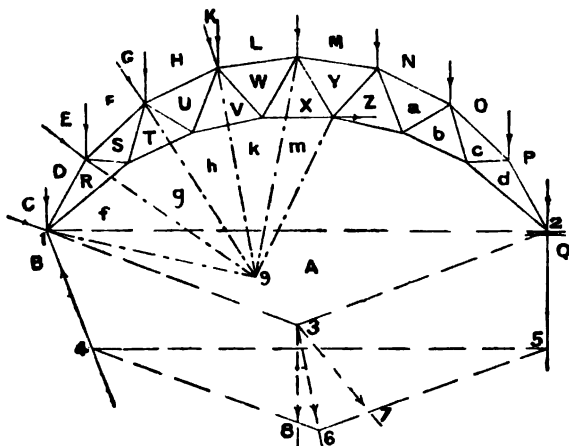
FRAME DIAGRAM. BOWSTRING TRUSS.
